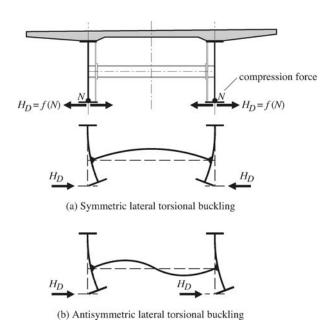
Flanges in compression near to the piers and possible deformations of the cross girders.
